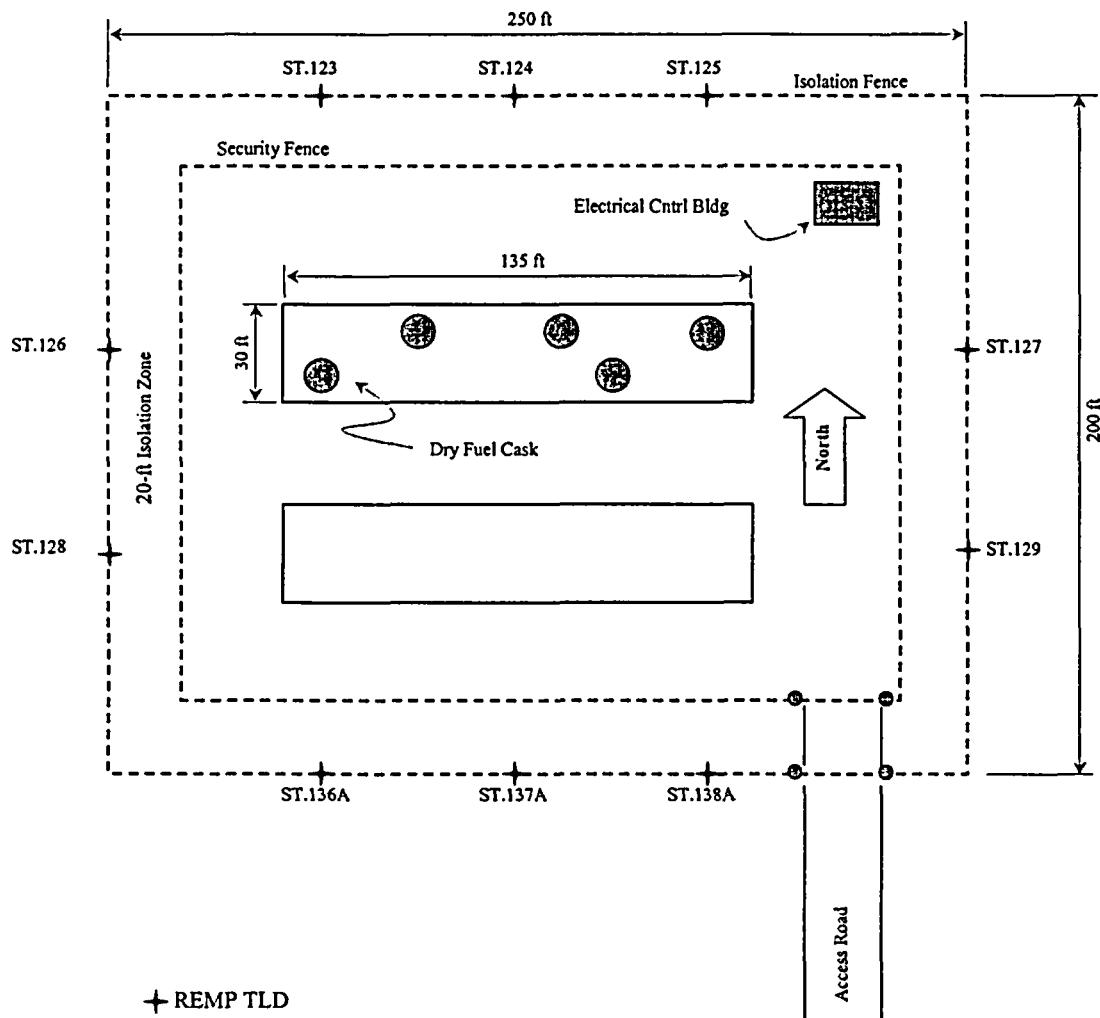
ISFSI TLD STATIONS LAYOUT
